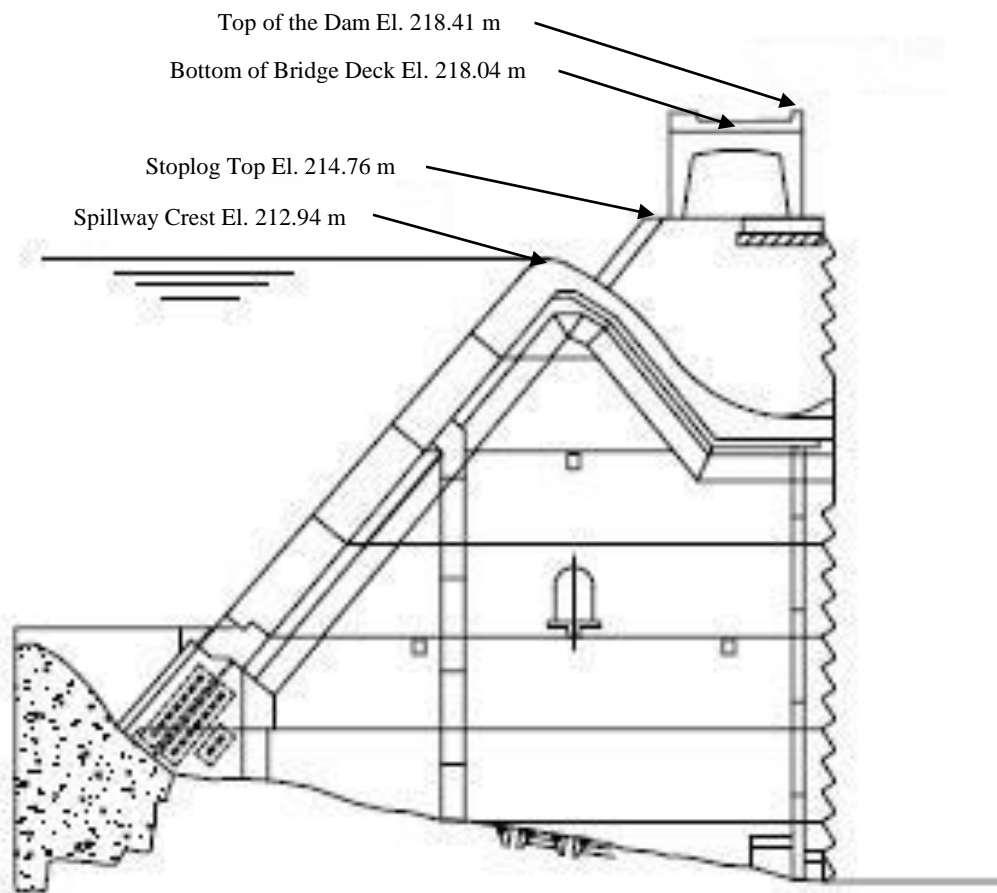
Elevation View of Spillways at Seymour Falls Dam (GVWD Drawing: WG 272 Sheet 36).
